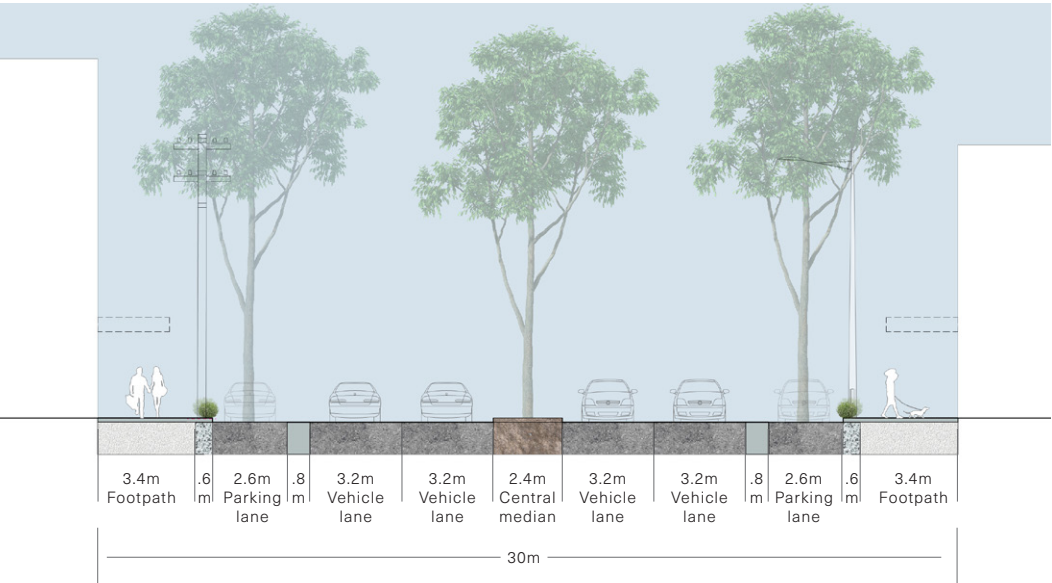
Section A-A' of Mercer Street north block showing the short term proposed condition
